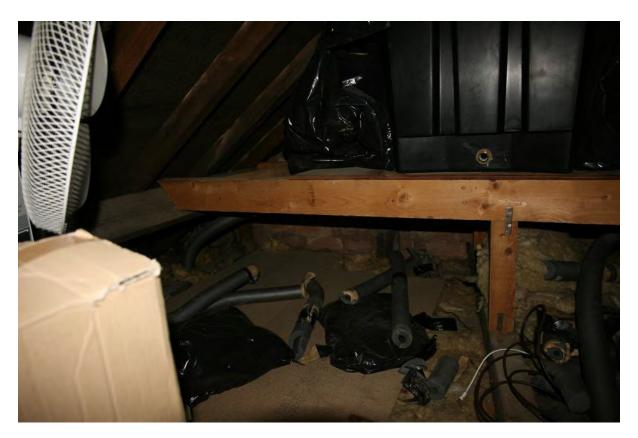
Attic space, looking north (LMSC16 D100 (104))
